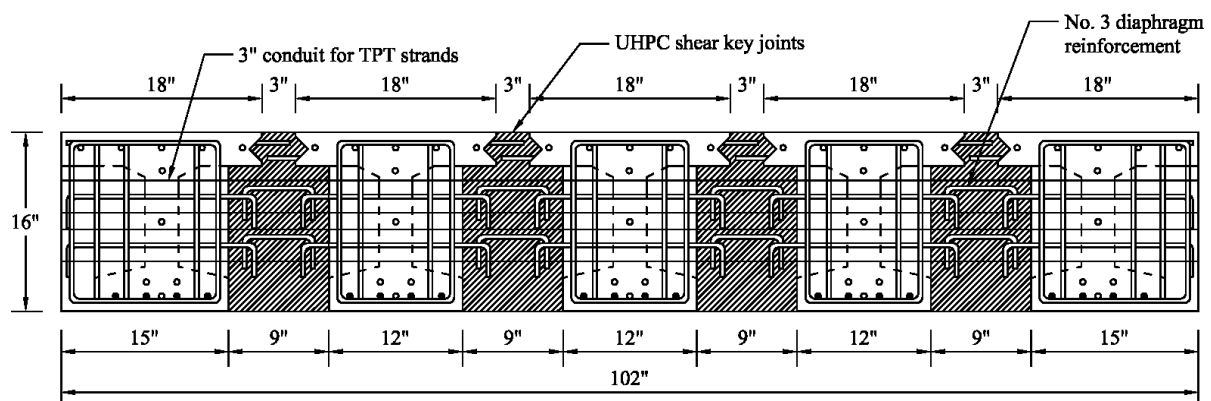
Cross section of bridge model at intermediate diaphragms
